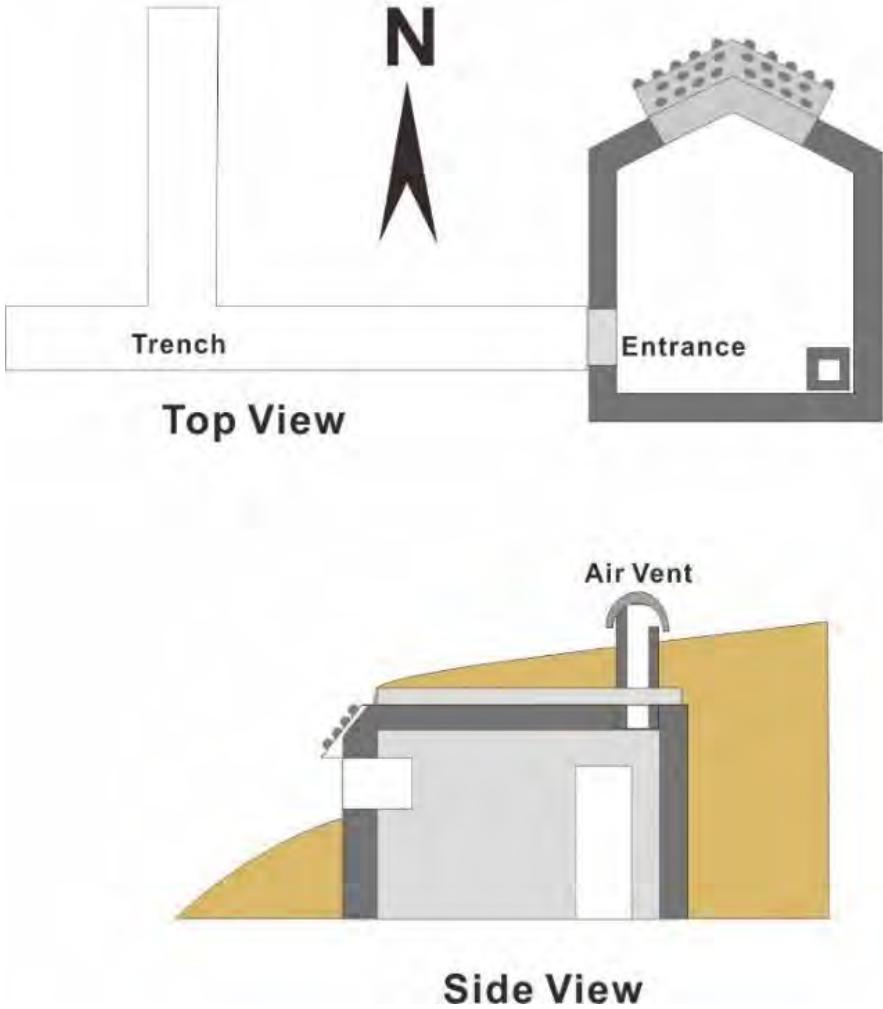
Sections of Type 1 OP Jardine's Lookout (not to scale)
